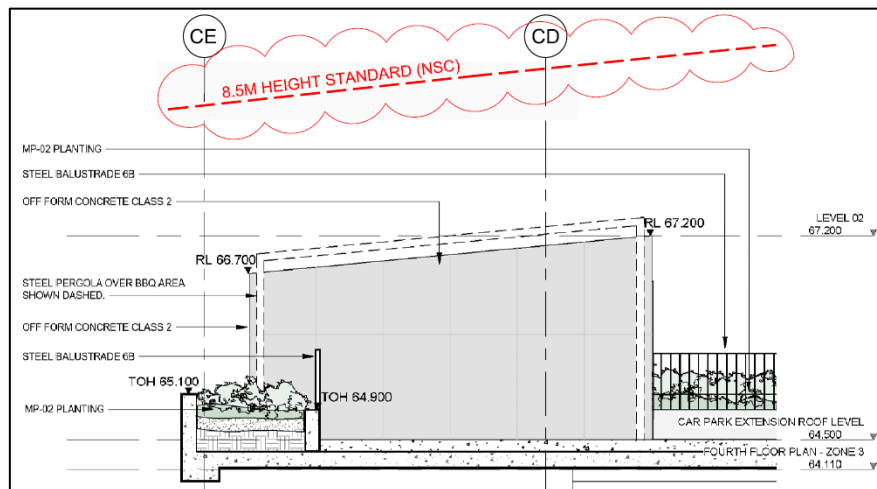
| Detailed section of stair overrun and barbeque shelter (Source: Applicant's Modification Application 2019)
